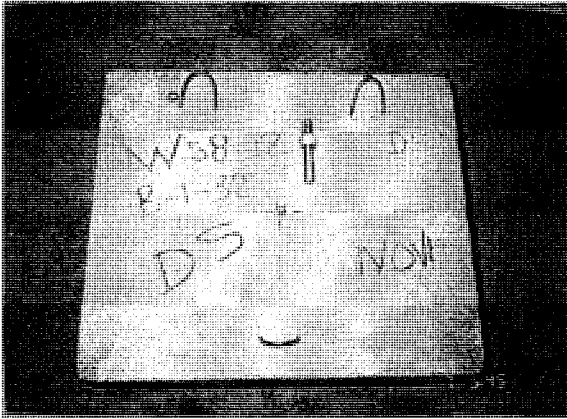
Typical Failure Mode A - Bolt yield or failure
